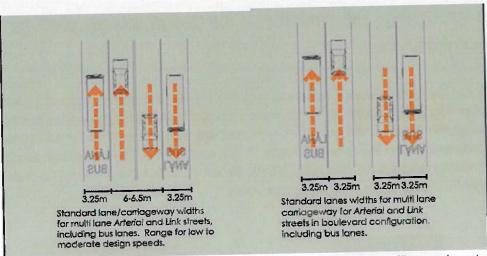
Extracts from DMURS Showing unsuitable lane widths. On page 113 DMURS states: "When carrying out upgrades, or traffic calming works on existing streets, the first priority of authorities should be to narrow existing carriageways where they exceed those standards listed above" Note these examples also show bus lanes of width 3.25m.
